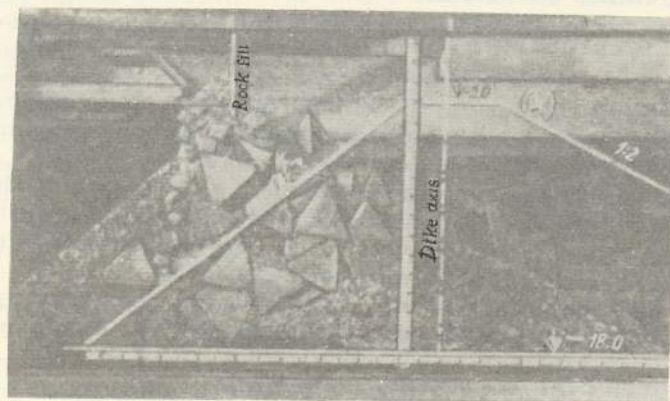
Construction of dam by filling the water passage along its whole length, to a height at which the stone mound retains its triangular shape
